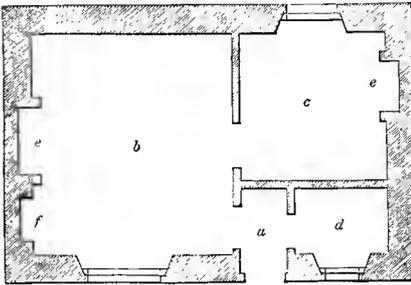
Ground-plan of a small hind's house with two rooms.
